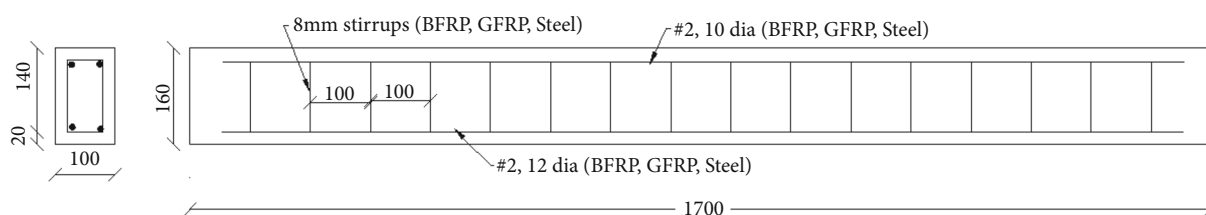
Geometry and reinforcement details of the beam (all dimensions are in mm).
